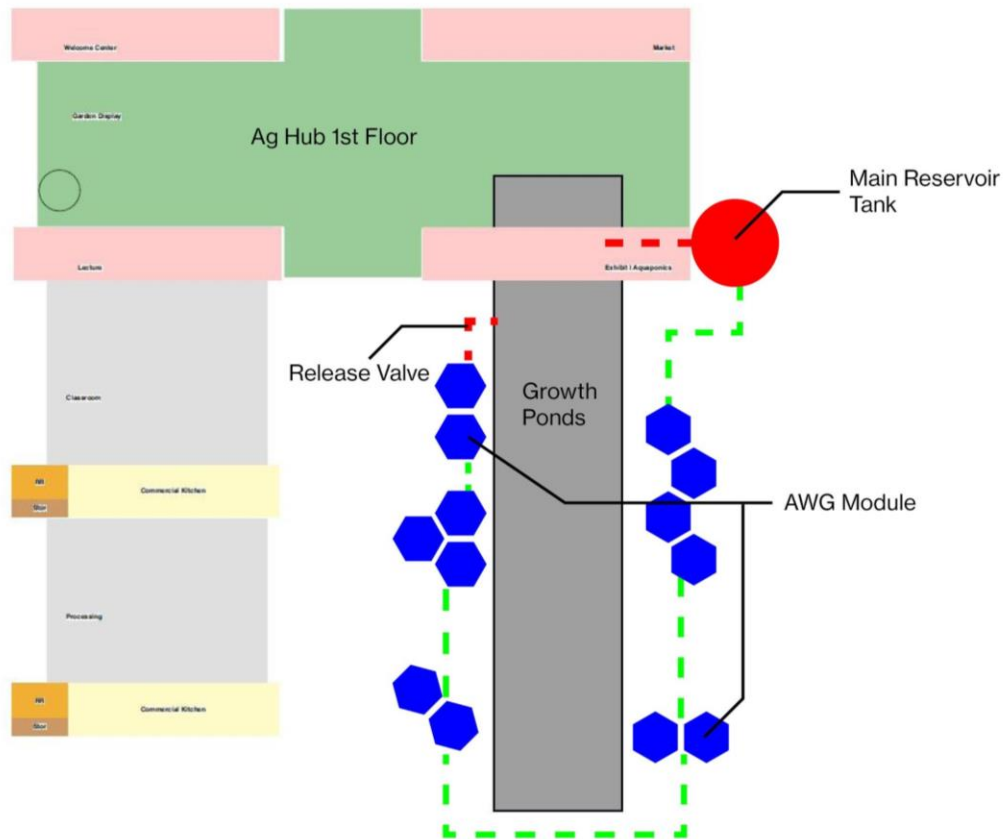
Site plan and pipeline layout for water [Martinez 2020]
